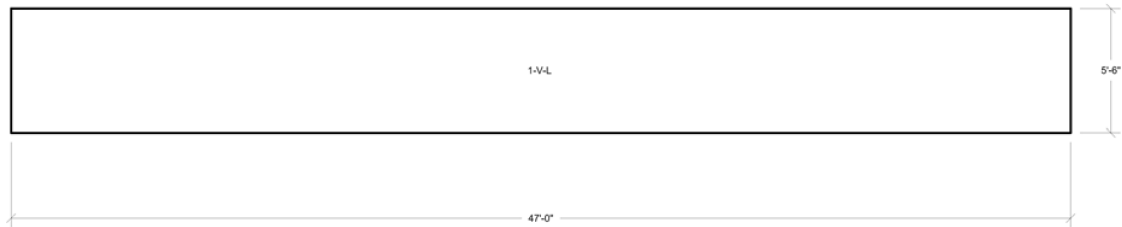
H.7-16 Tunnel and Access Region Basemat Looking Down Vertical Reinforcement Zones Near Side and Far Side Faces
